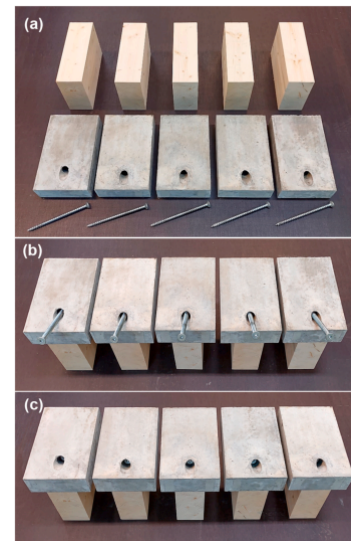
Dry to dry connection (Derikvand, 2021)
